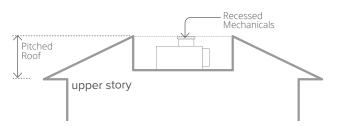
Recessed Mechanicals in Pitched Cap Type
